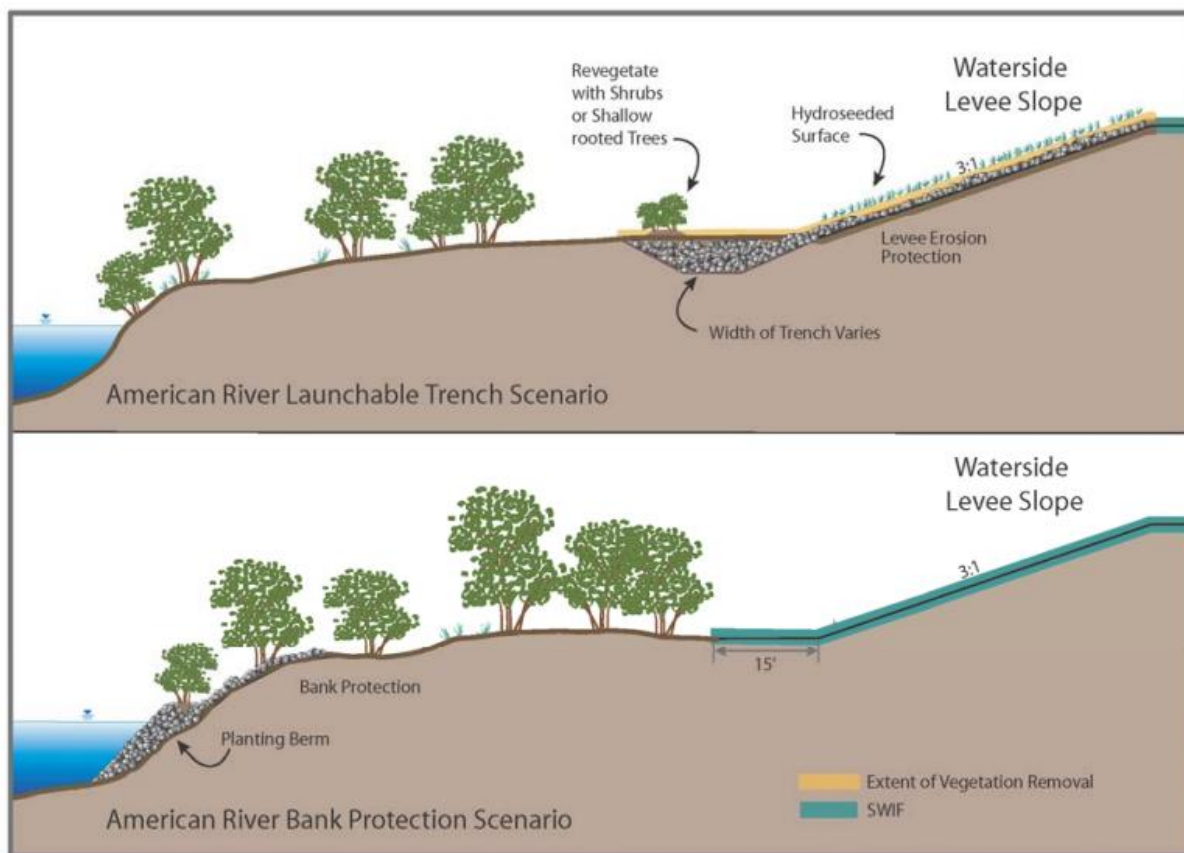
Bank Protection and Launchable Rock Trench Typical Design.
